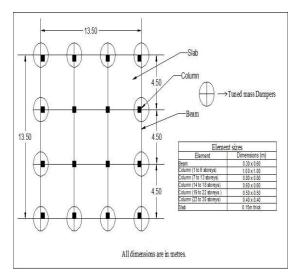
plan of model with twelve TMDs at all exterior joints.
